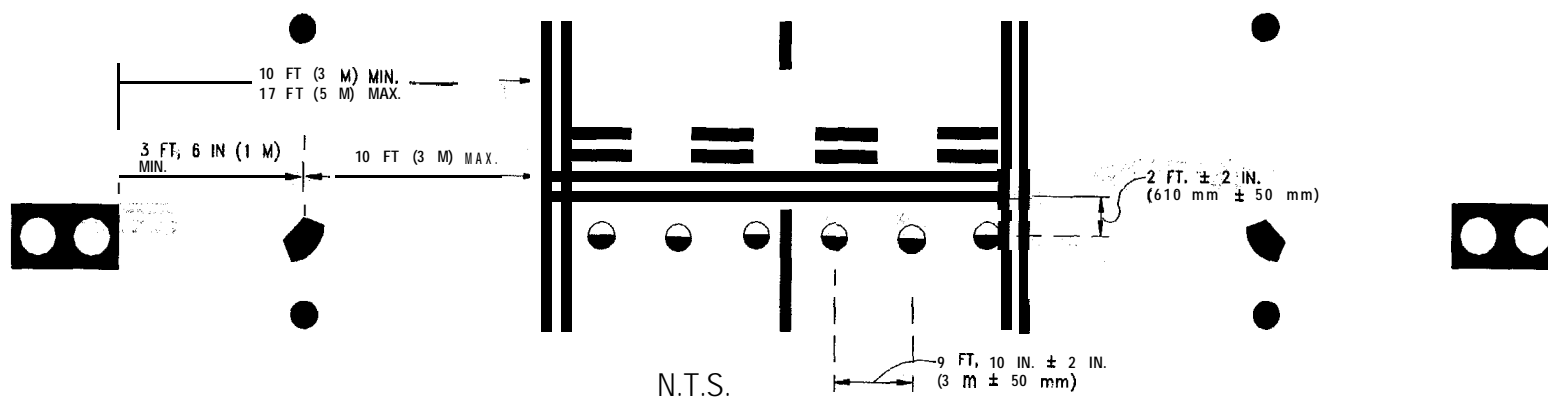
TYPICAL LIGHT BEAM ORIENTATION FOR IN-PAVEMENT TRGLs AND STOP BARS
